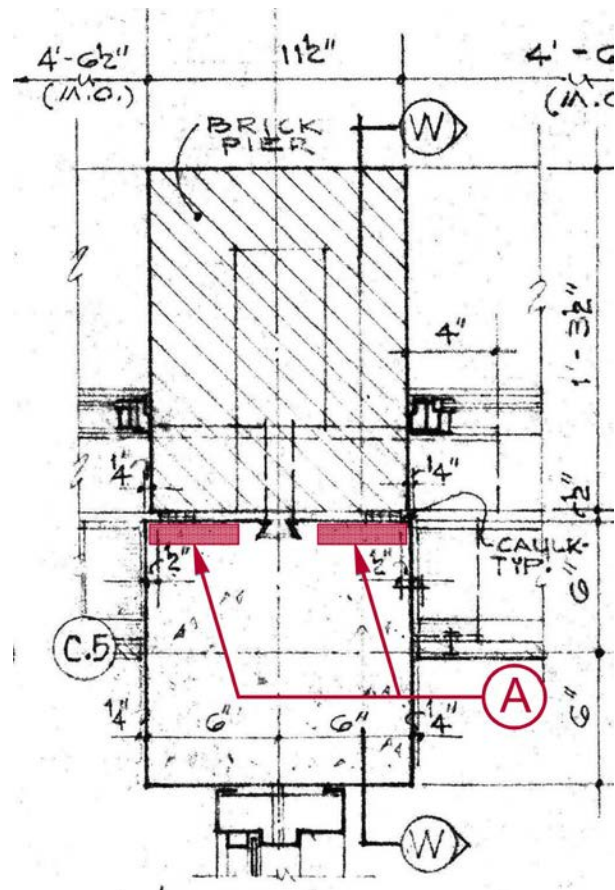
A = concrete to be scarified and parged. [From 1968 Drawing A-18]
